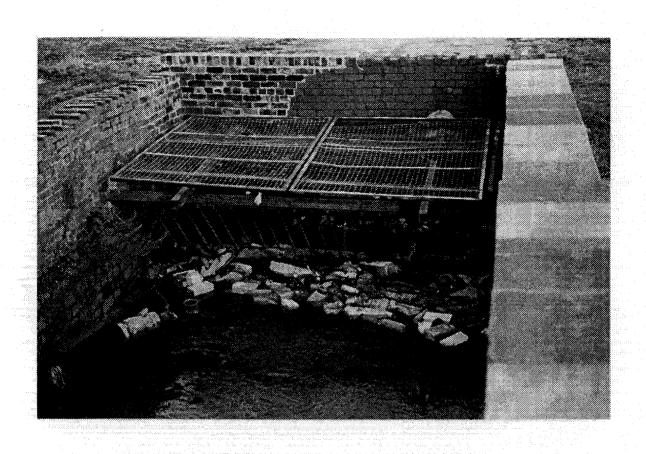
CULVERT No.17 (Inlet above - Outlet below)
